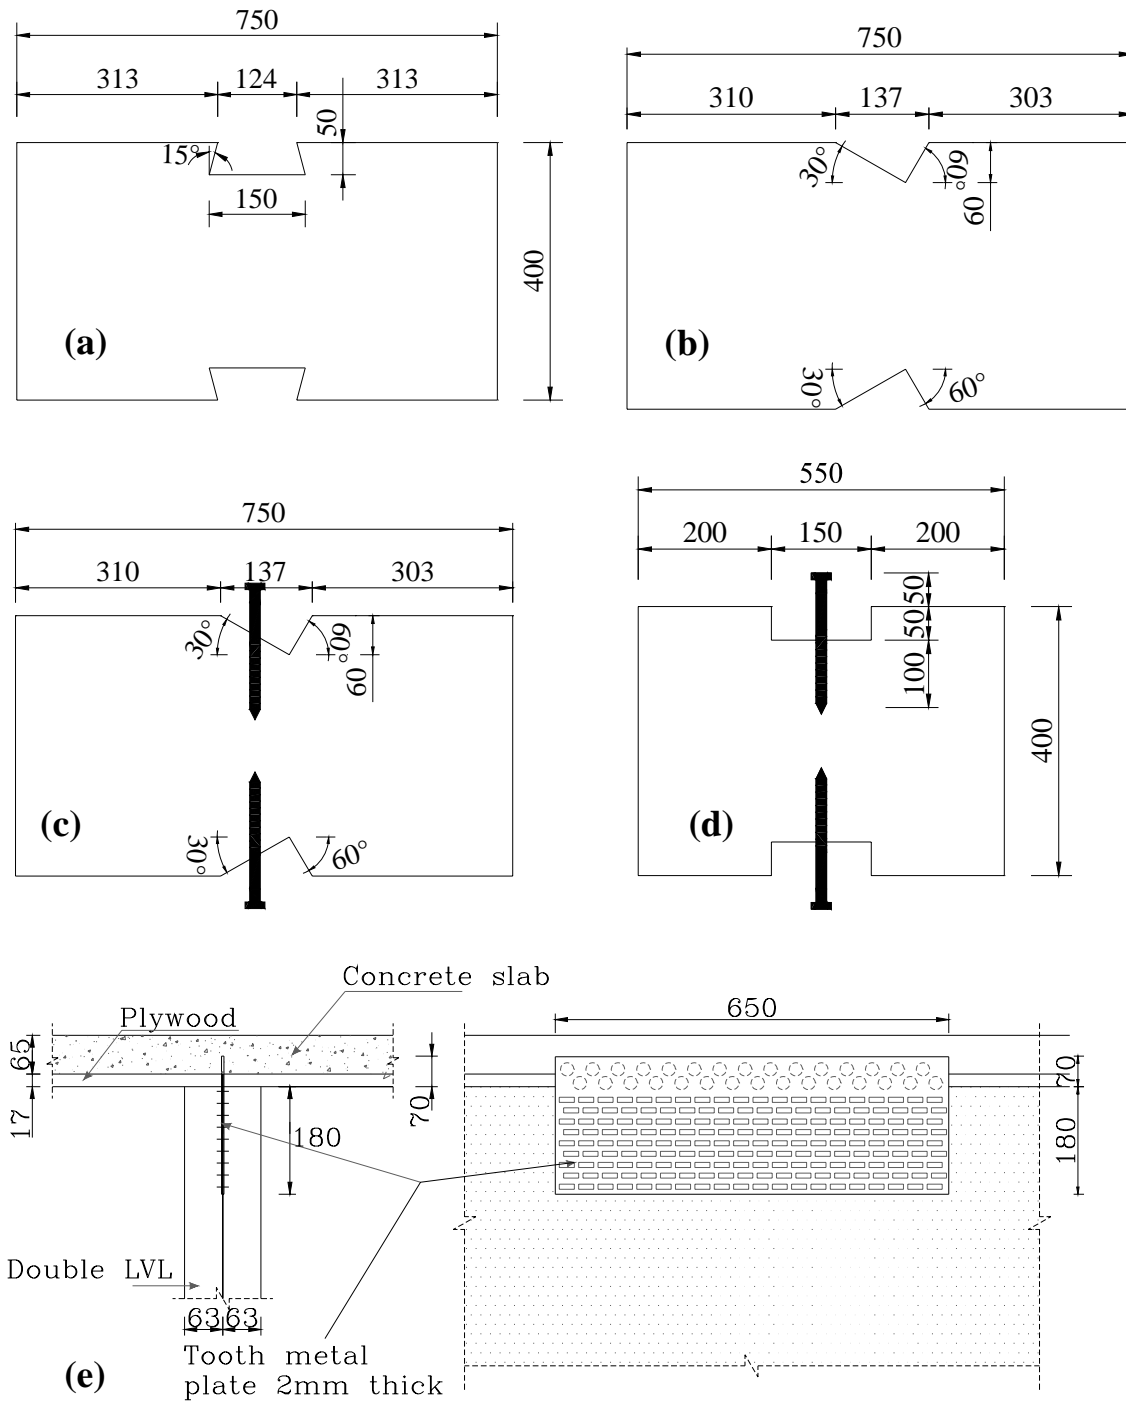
First phase push-out test specimens, D1 to H4: (a) D1 - Doves tail notch 150×50×63 mm; (b) E1 - Triangular notch 30°\_60° 137×60×63 mm; (c) E2: Triangular notch 30°\_60° 137×60×63 mm coach screw  $\phi 16$ ; (d) F1: Rectangular notch short end 150×50×63 mm coach screw  $\phi 16$ ; (e) H2, H3, and H4 – Toothed metal plate of length 650, 325 and 150 mm, respectively.
